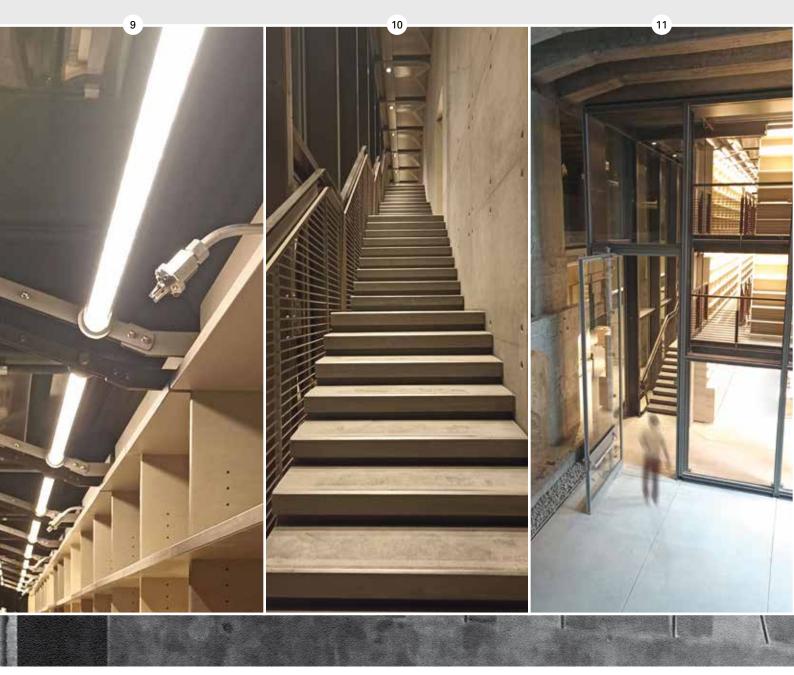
Library - Existing staircase behind the west wall. Here we can find the large windows housed between the metal pillars, the sheet metal roofing elements with insulating panels as well as the entire electrical and lighting system
